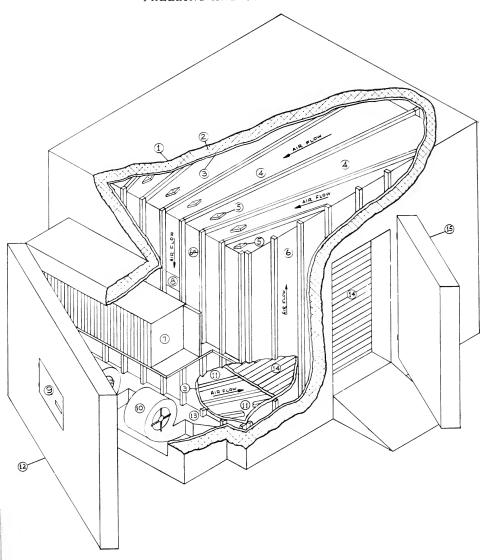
Cross-sectional view of jacketed cold storage room.
